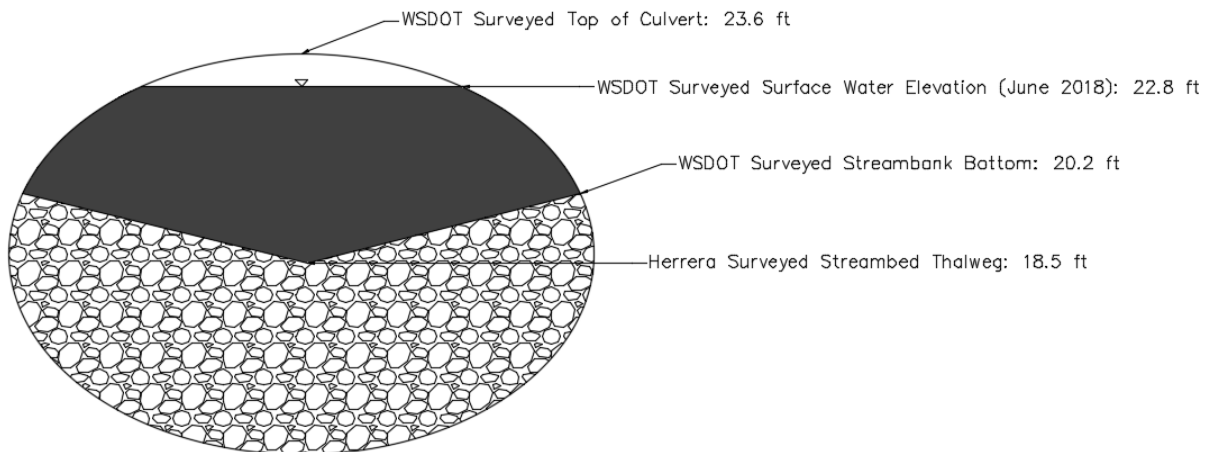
Freeman Road Culvert Cross Sections with Hydraulic Opening Denoted with Arrows.
